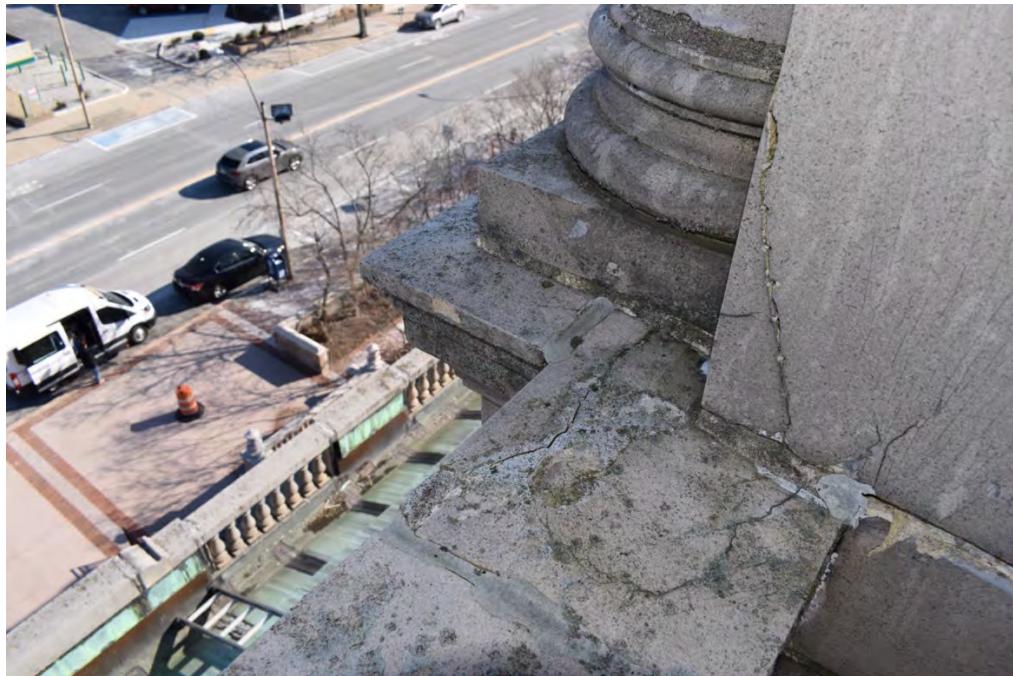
The top surface of the terra cotta sill units and the adjacent jamb are cracked in several locations.
